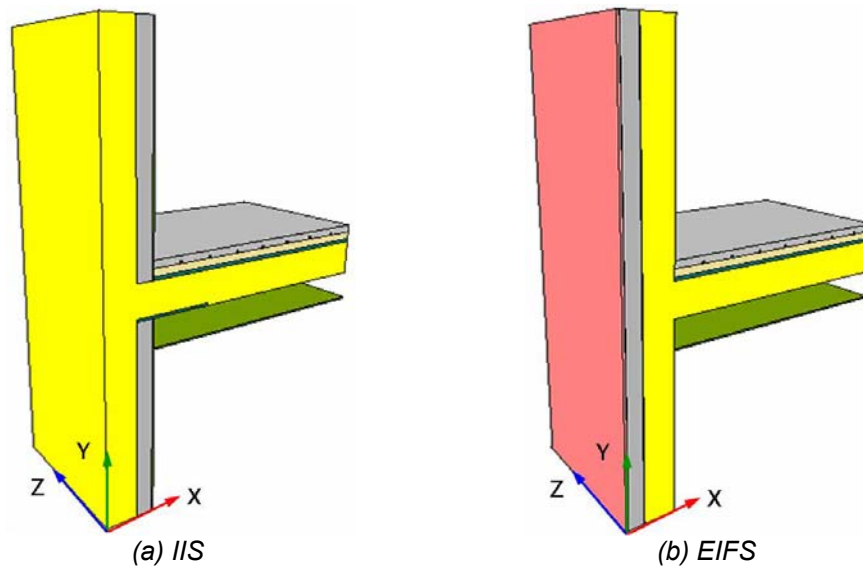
Simulation model of the side wall-slab joint (x: 1,849.5mm, y: 2,690.0mm, z: 1,000.0mm)
